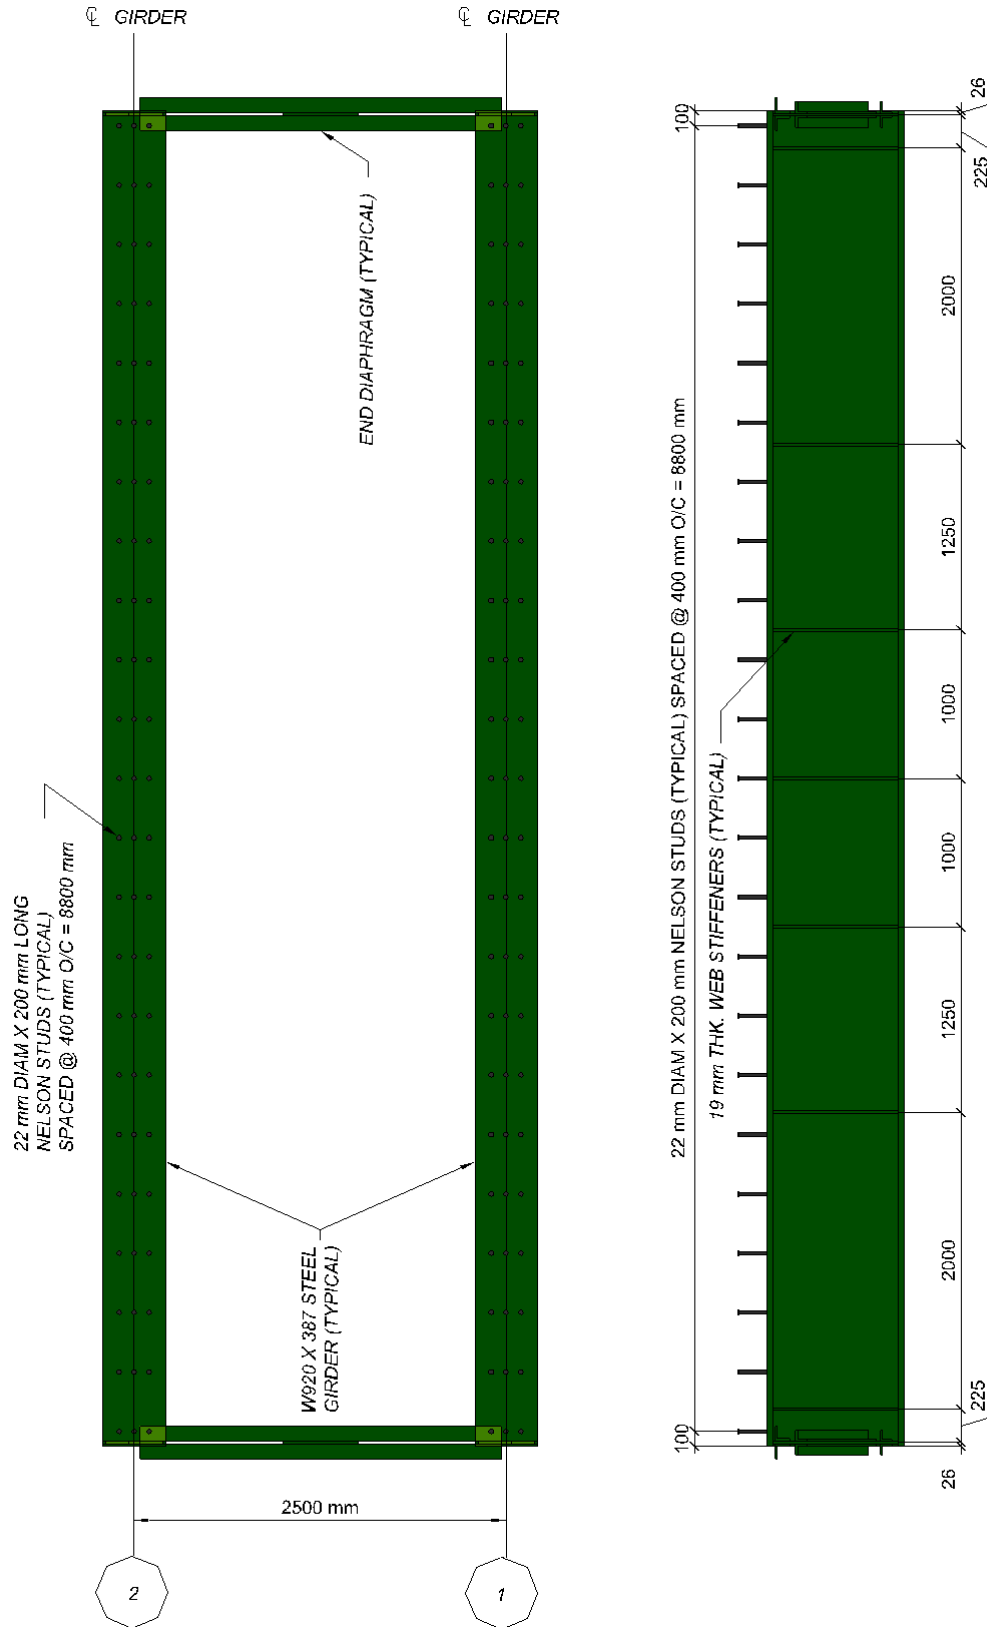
Plan and side view of girder configuration schematic used in this experiment
